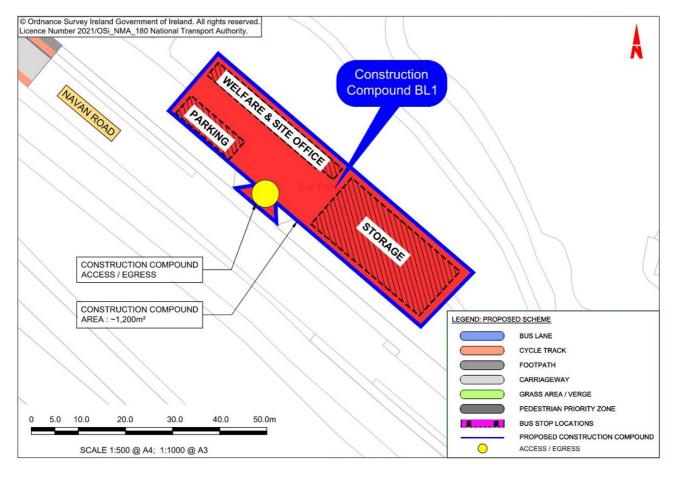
Location, Extent and Layout of Construction Compound BL1
